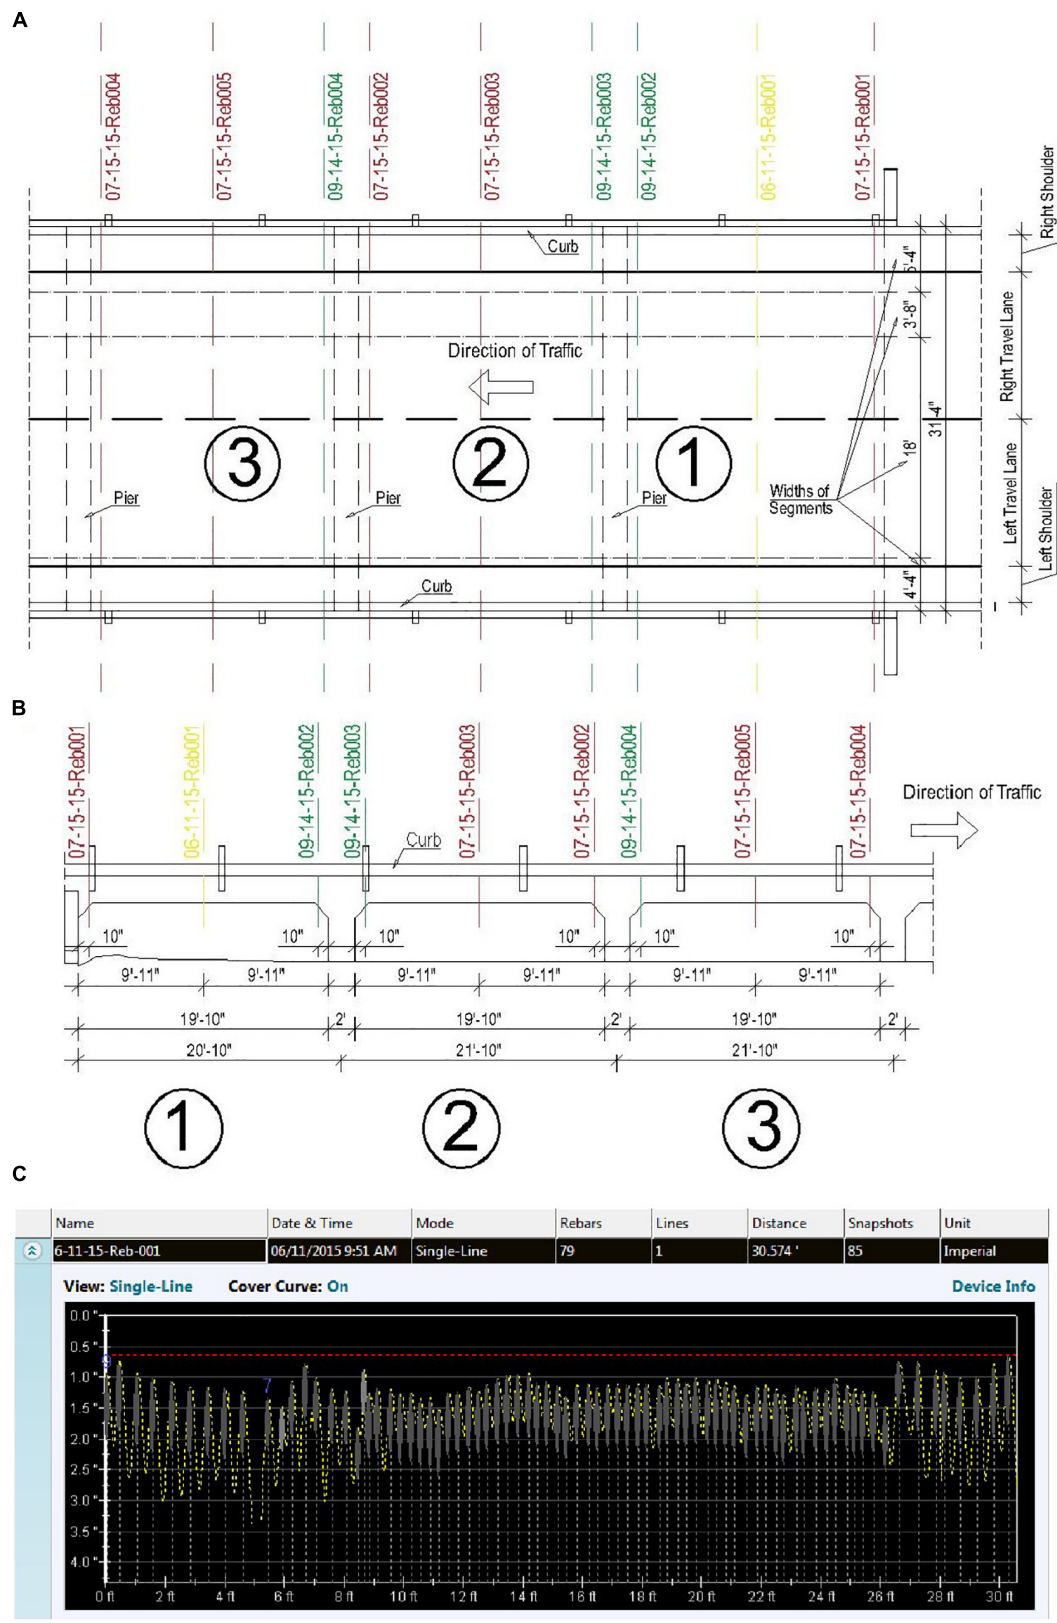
| (A) Location of the reinforcement measurements – plan view, (B) location of the reinforcement measurements – NE elevation, (C) line measurement of reinforcing bars – scan 06-11-15-Reb001 (1 ft = 0.305 m, 1 inch = 25.4 mm).
